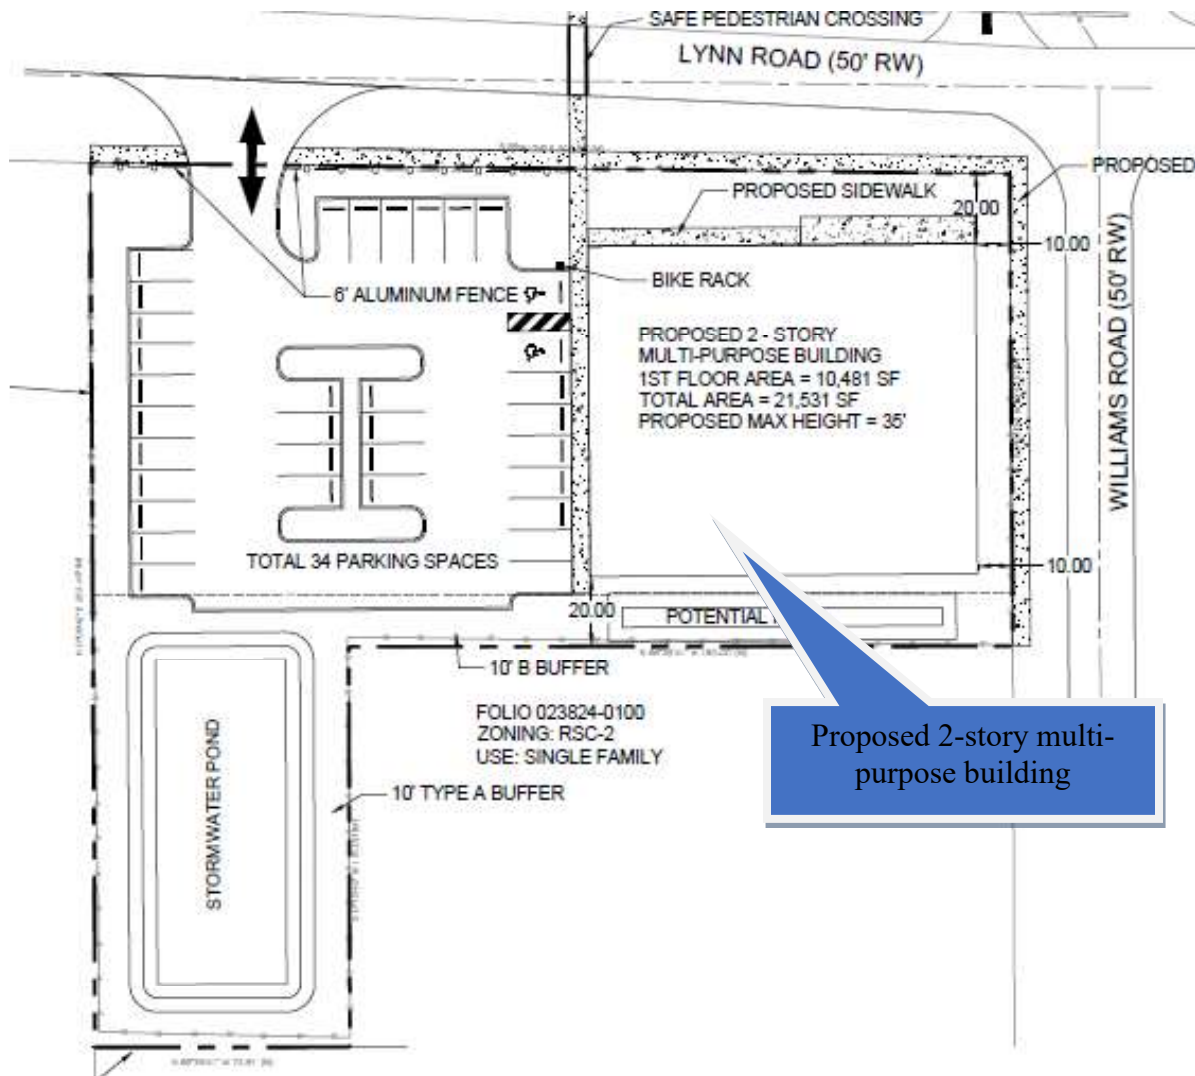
Proposed Acreage and Buildings (south side of Lynn Road)
